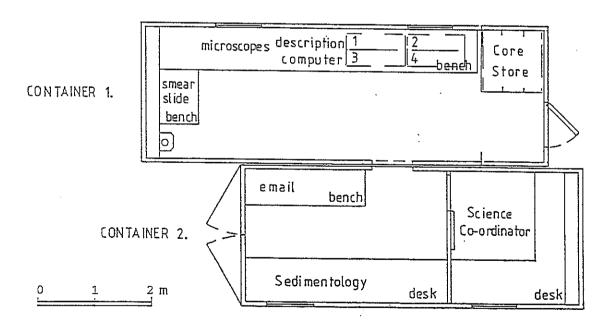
Floor plans of Drill Site Laboratory (upper) and the Cape Roberts Laboratory (lower).
